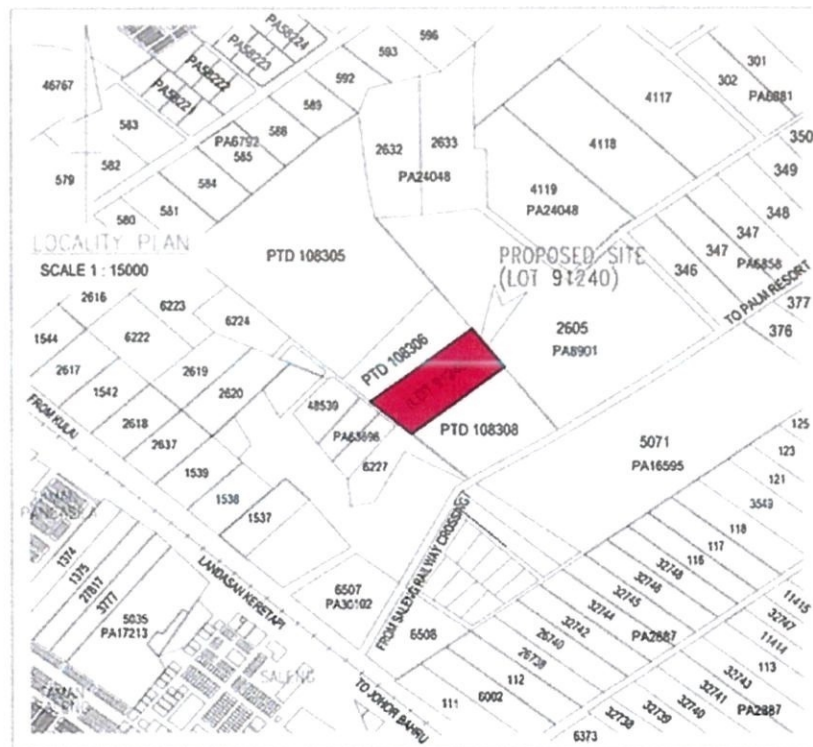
Plan Location (source: Yeo Plumber Sdn Bhd Shop Drawing)
